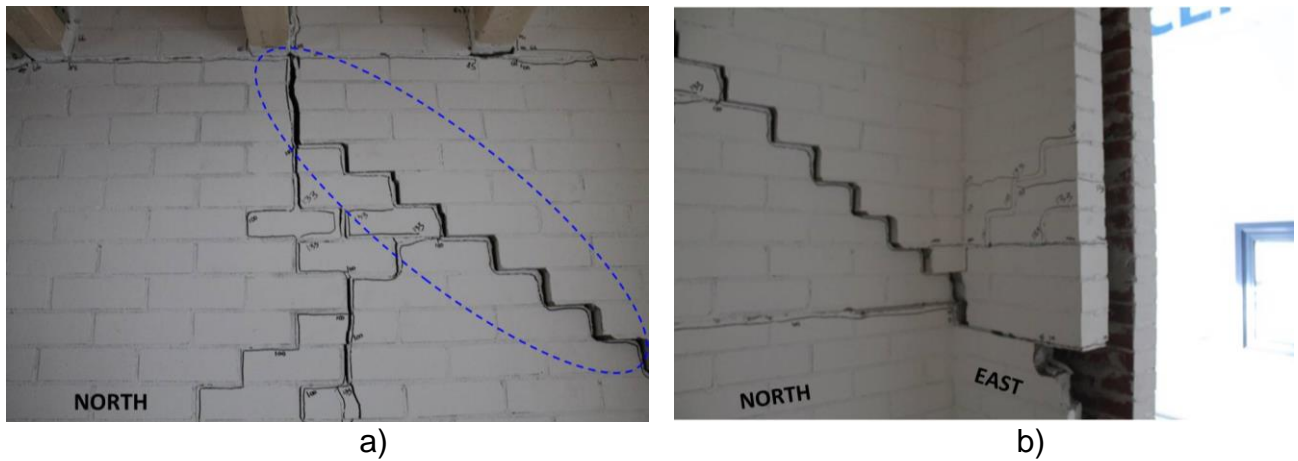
Crack C13 after EQ-NPR IS 133%: a) looking North; b) North-East walls intersection.
